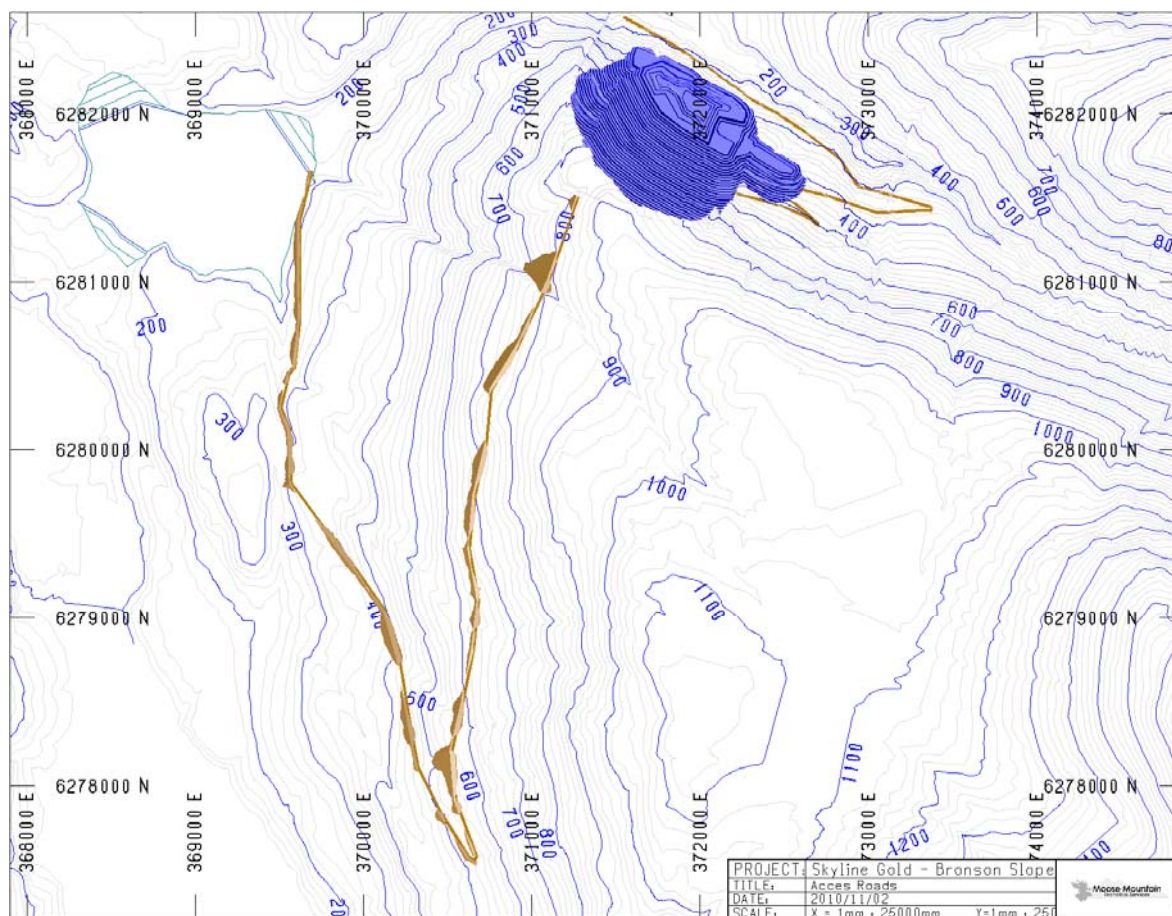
Pit 1 Access Road Route (In Relation to Final Pit Limit)
